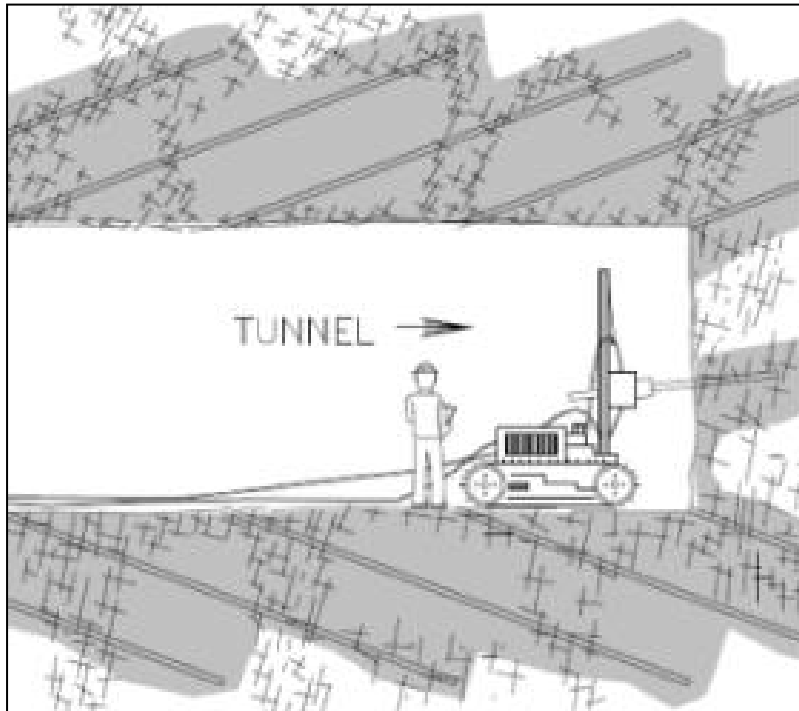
Pre-consolidation grouting ahead of tunnel excavation.
